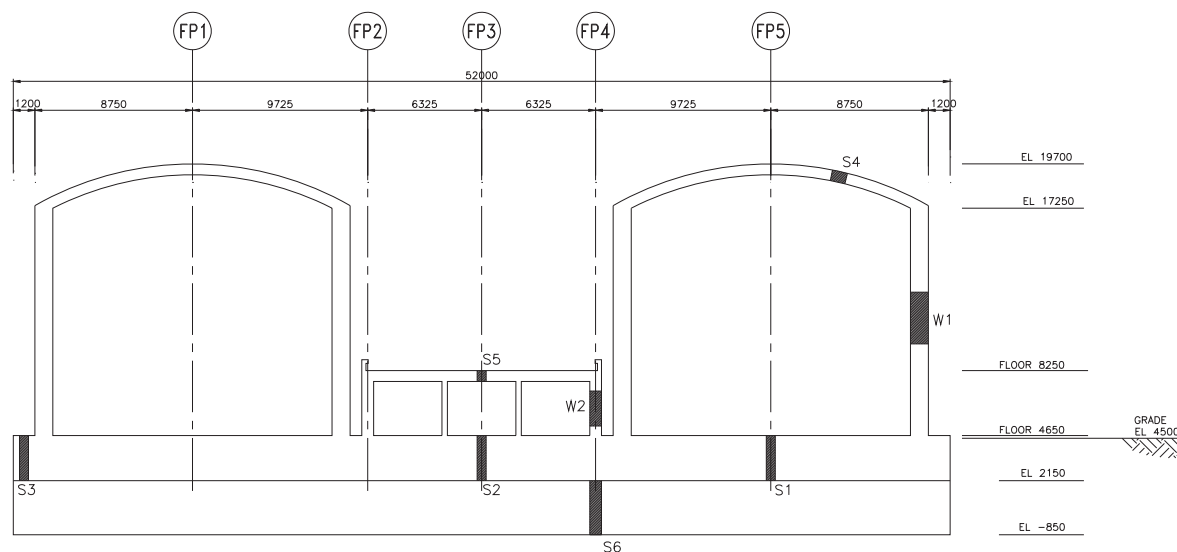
G.4-7. Sections Where Thermal Loads Are Defined
